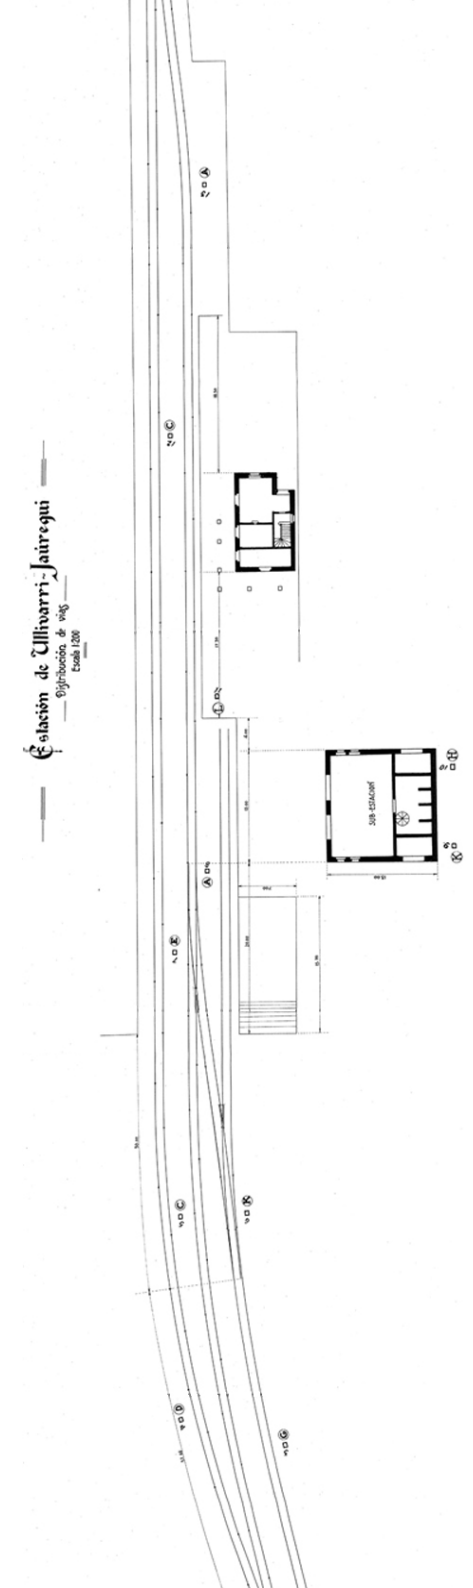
Railway station area of Uribarri-Jauregi composed of passenger building, electrical substation and uncovered loading bay (left). Alejandro Mendizábal, FEVE's Collection in RMA
